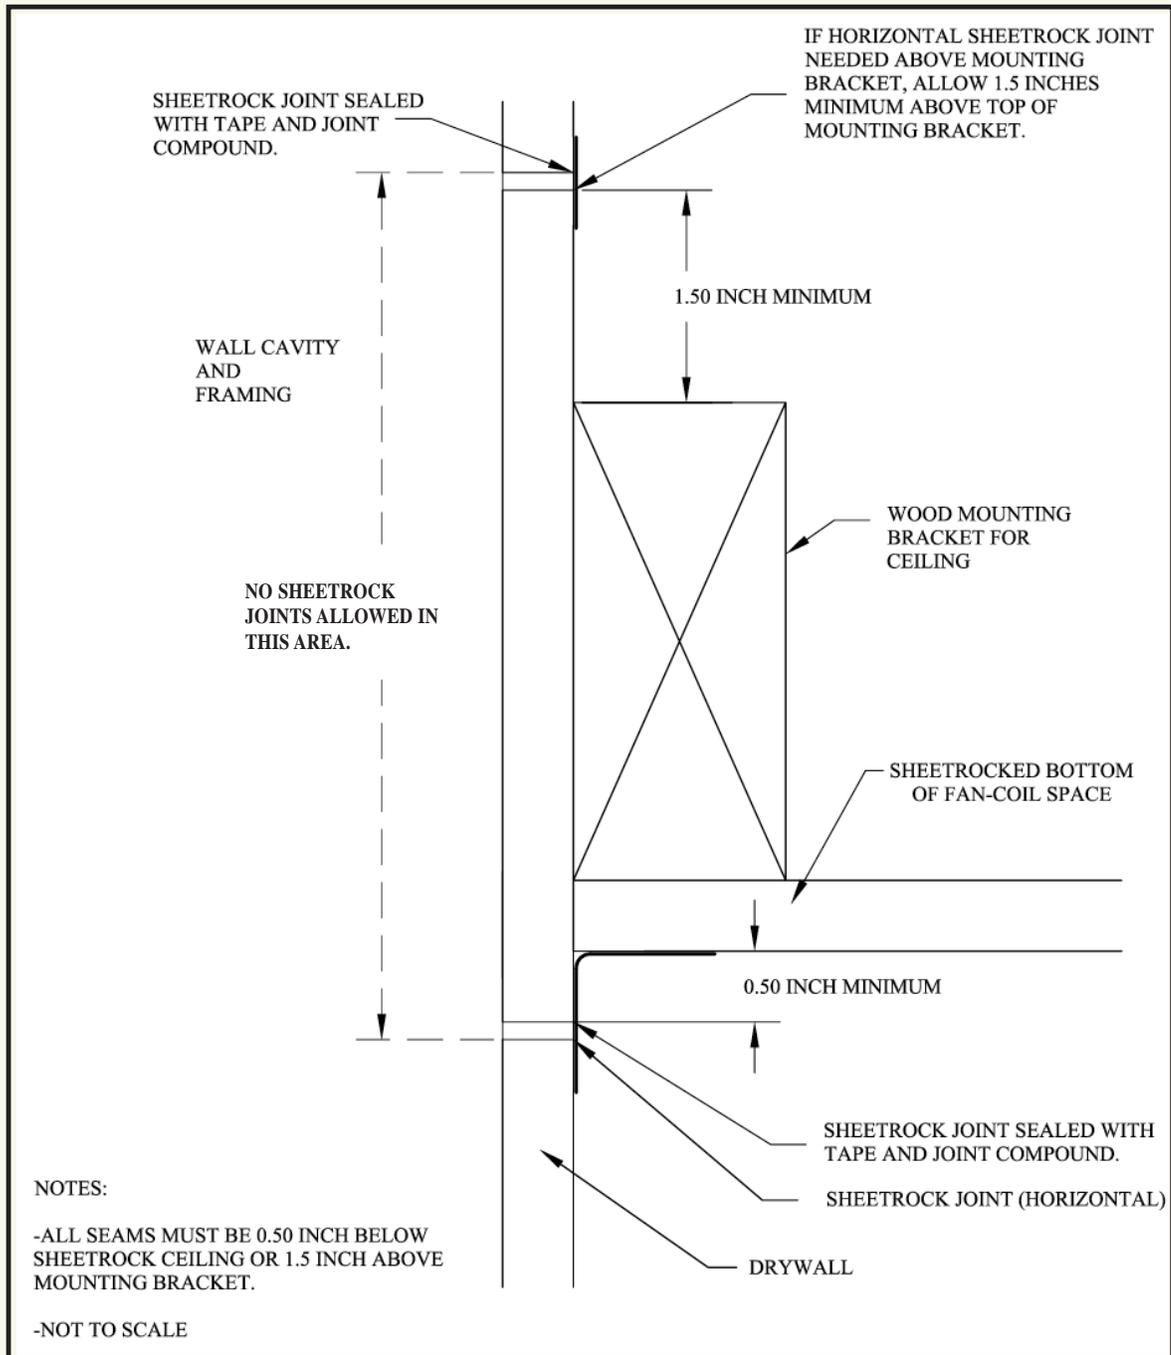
Cross-section drywall details for fire code separation for multi-family, non-ducted ceiling returns for fan coil units – Wood Bracket
